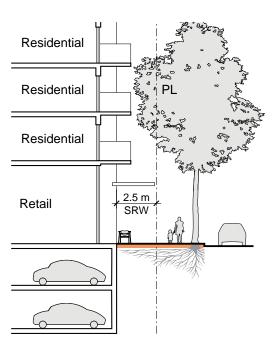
The front yard is intended to accommodate a statutory right-of-way for sidewalk widening. Underground parkades are set back to retain existing high value street trees.
